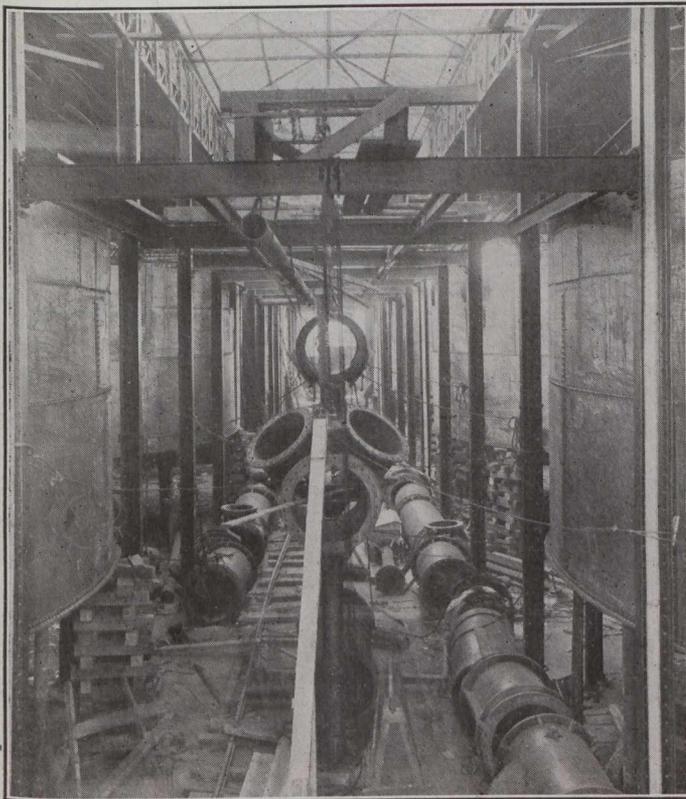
Filter House During Installation of Pipe Connections in Central Gallery. View Looking North.
